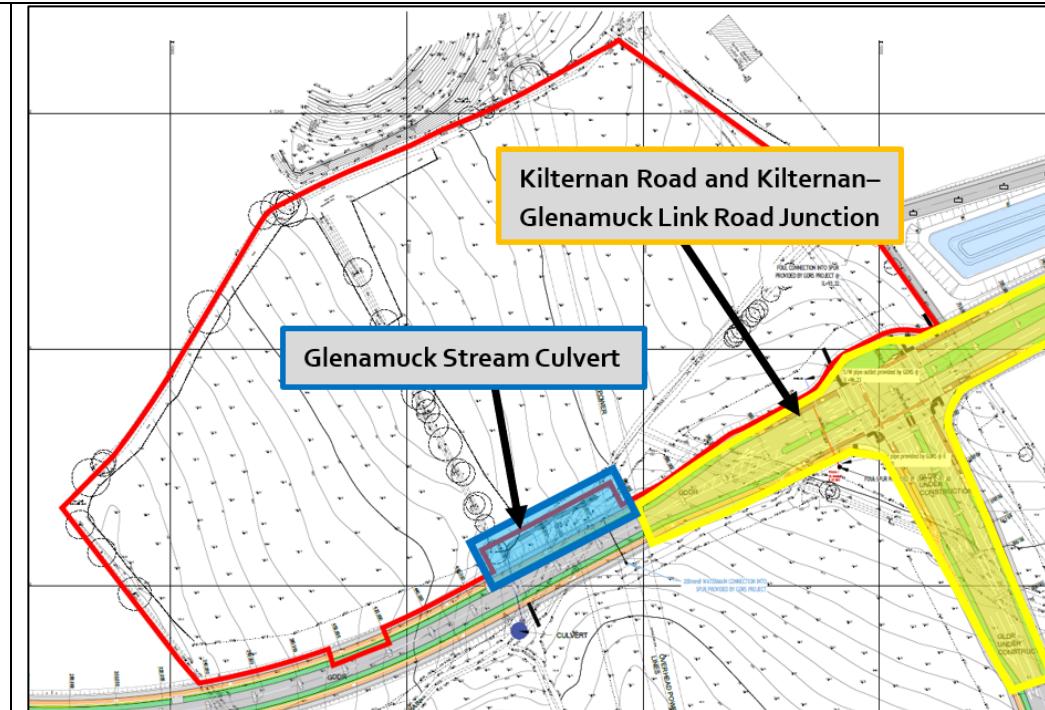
Existing Site Plan (Outlined in Red) with the Vehicular Access Restrictions Identified
